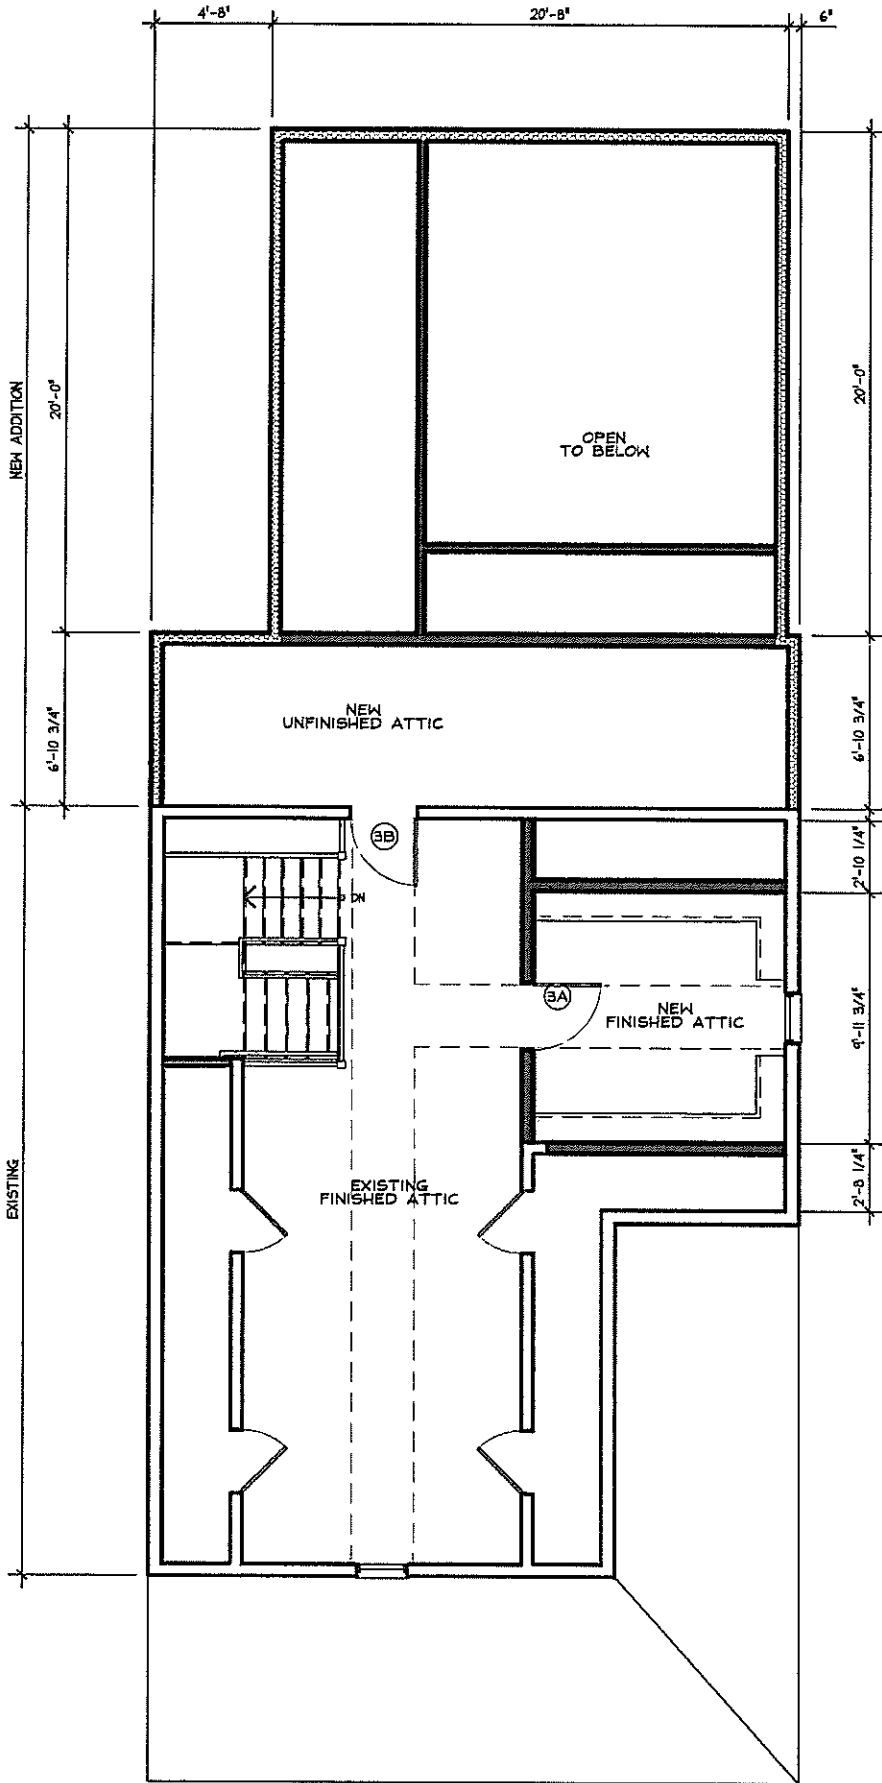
PROPOSED ATTIC FLOOR PLAN
